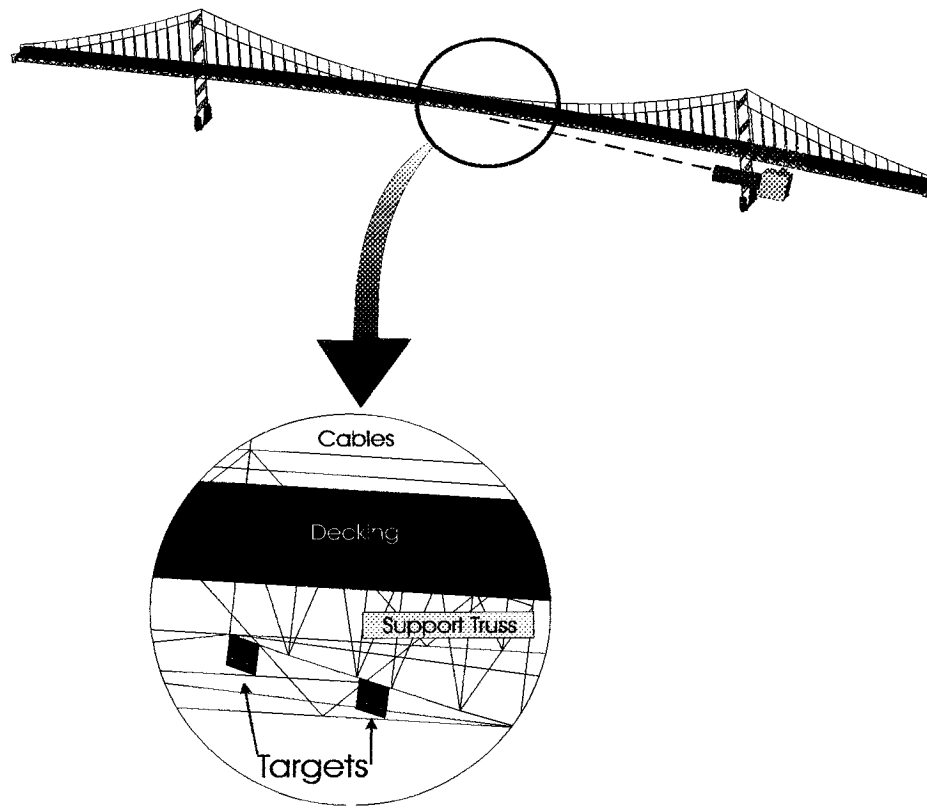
Schematic view of the test bridge optical instrumentation system.
